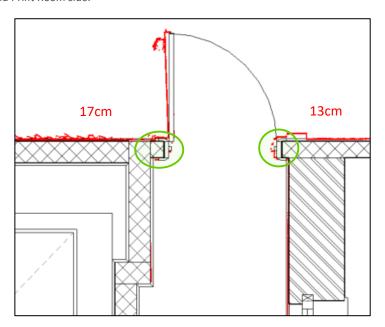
The 13 cm internal wall determined because of its best fit to the door frame of Room 102 A door.
